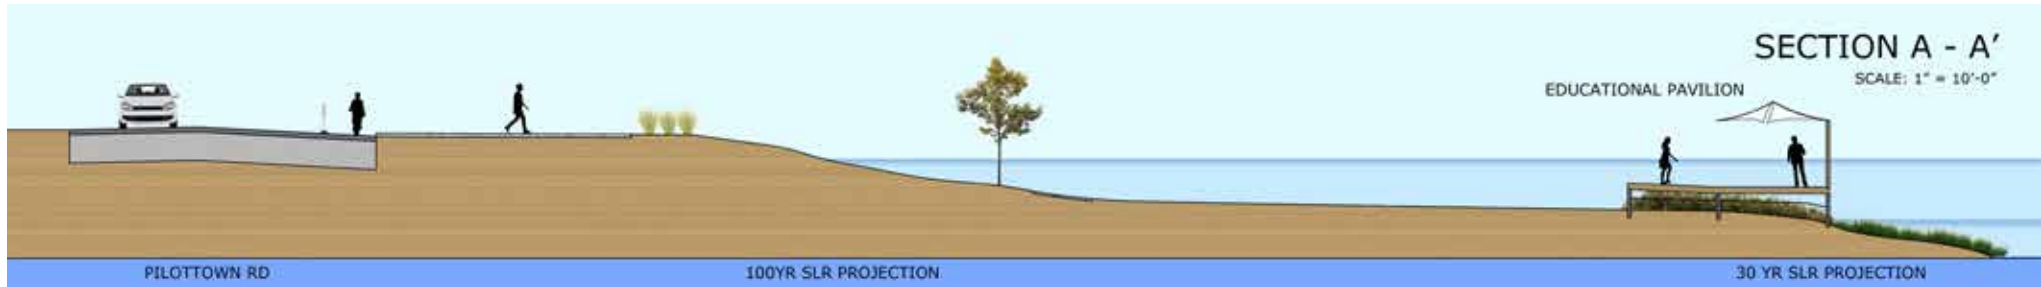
Section A-A' transects the NW side of the property, extending from a proposed Pilottown Road crosswalk through the sidewalk, pathway, palisade sculptures, boardwalk, and educational outlook. The boardwalk is supported by tall pilings that the deck can be detached from. In the future, the deck can be reattached at a higher point and retrofitted with a floating base. The outlook features the moveable shade sails as well as built-in seating and the same tall pilings that allow the deck to be floated and reattached.
